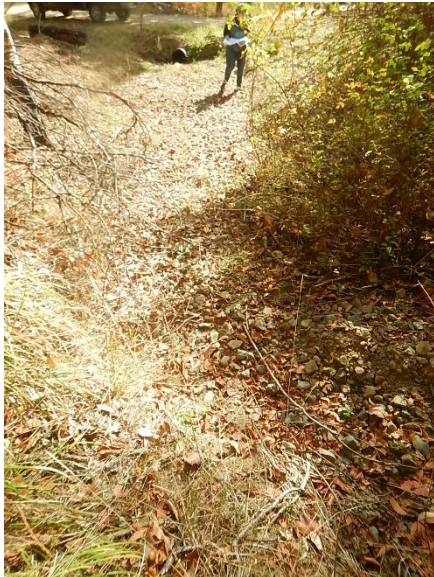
WQ3 inlet of crossing 7. Note minimal fill and channel width.
